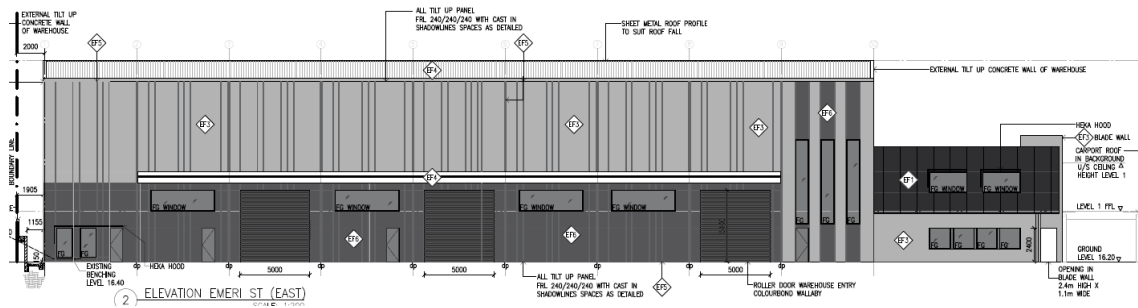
Proposed East Elevation (Source: Architects Dovey & Associates)
